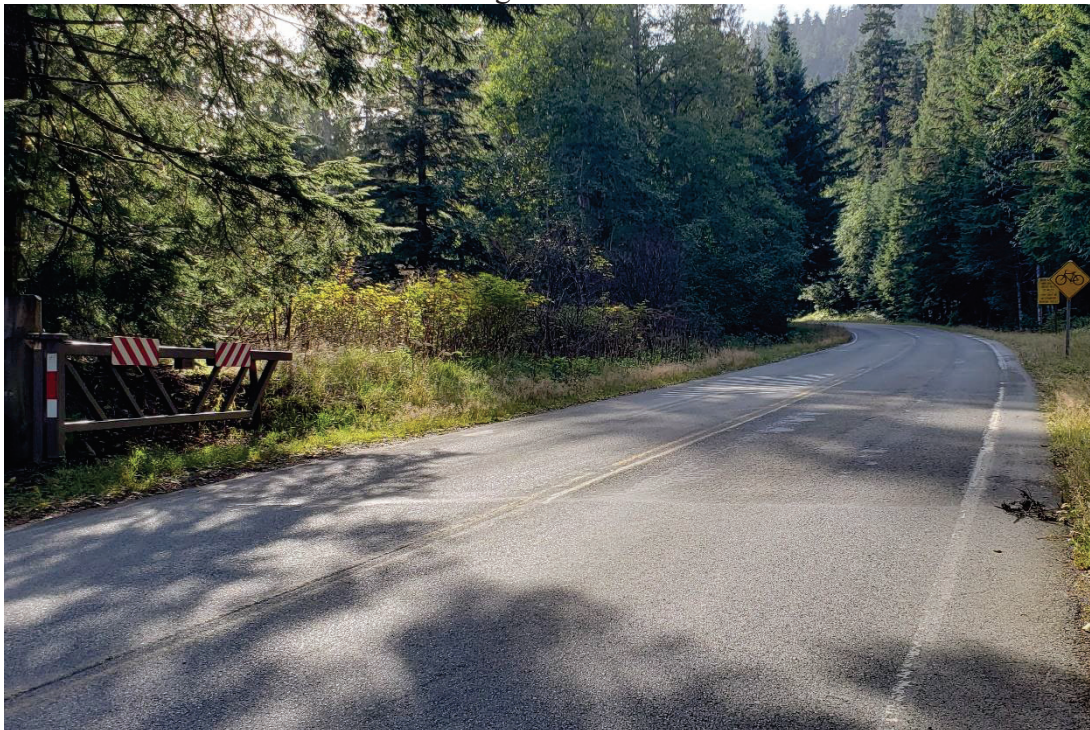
The gate south of the entrance station, and a typical section of the road. View to southeast.
